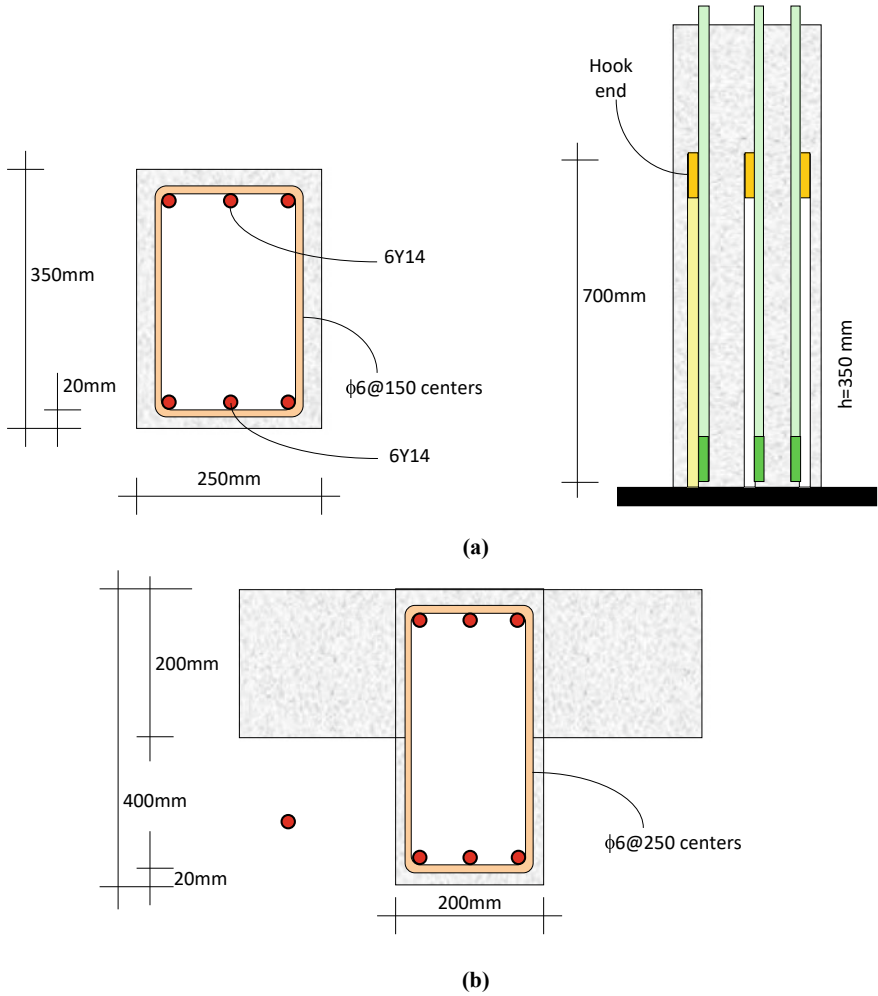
Member cross-sections and reinforcement details: a column, and b beam
